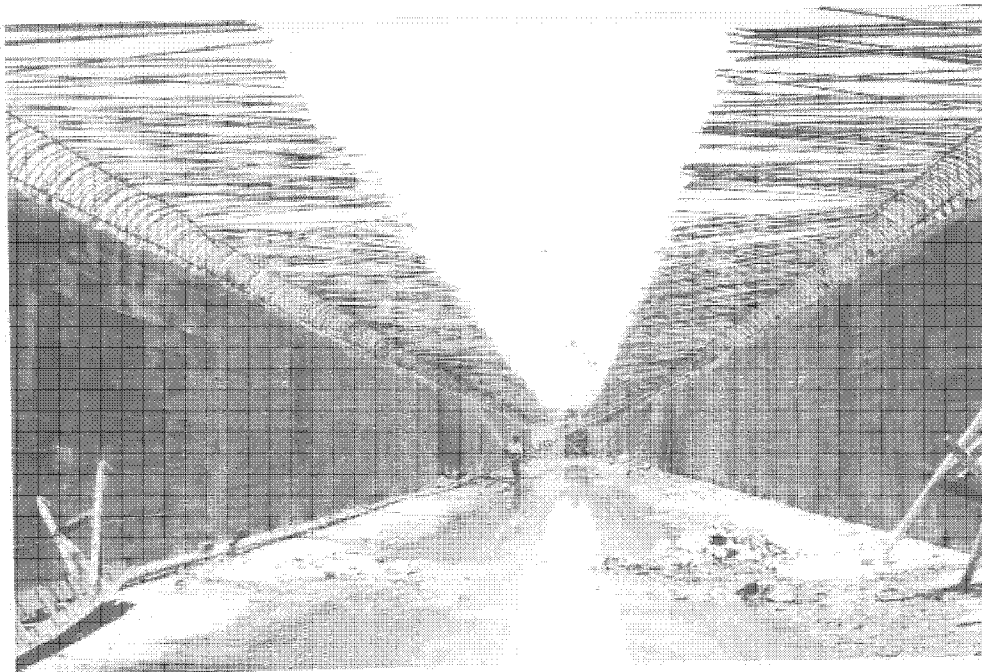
Closed Conduit "B" Concrete Walls Completed, 29 July 1937.
